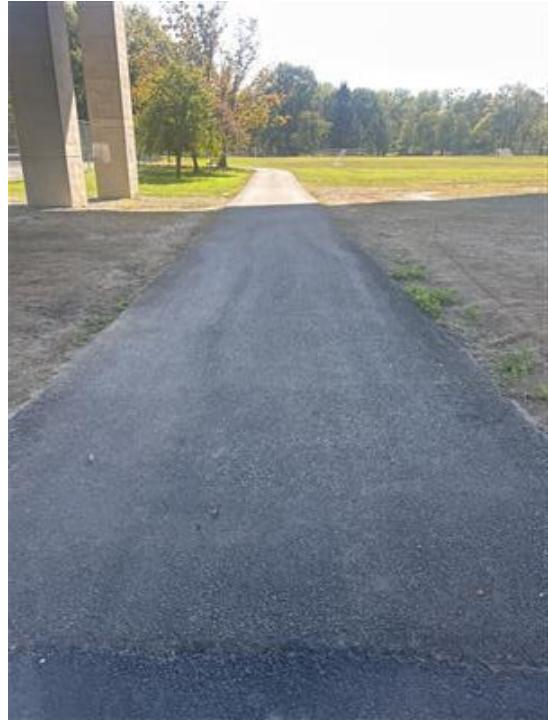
Asphalt Patch at Center Path/Western Loop Segment
